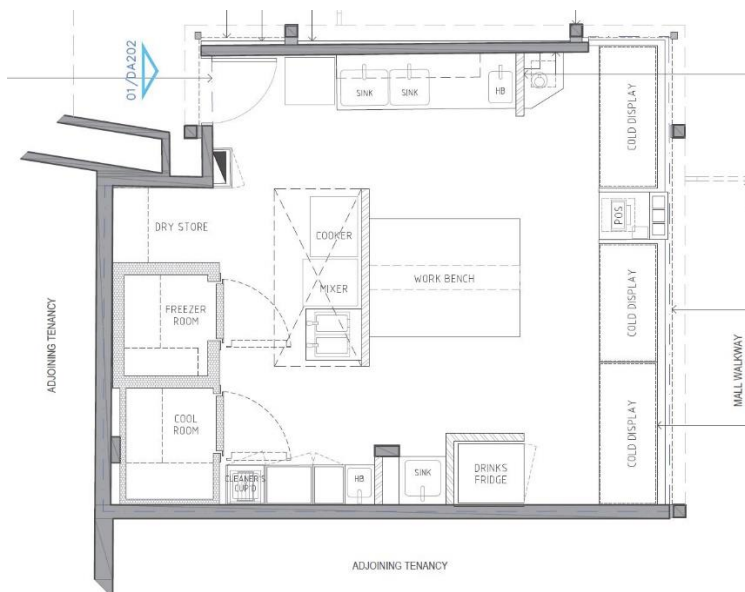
Proposed plan for new tenancy fitout of Shop 8. (Source: Avance Design 2022).
